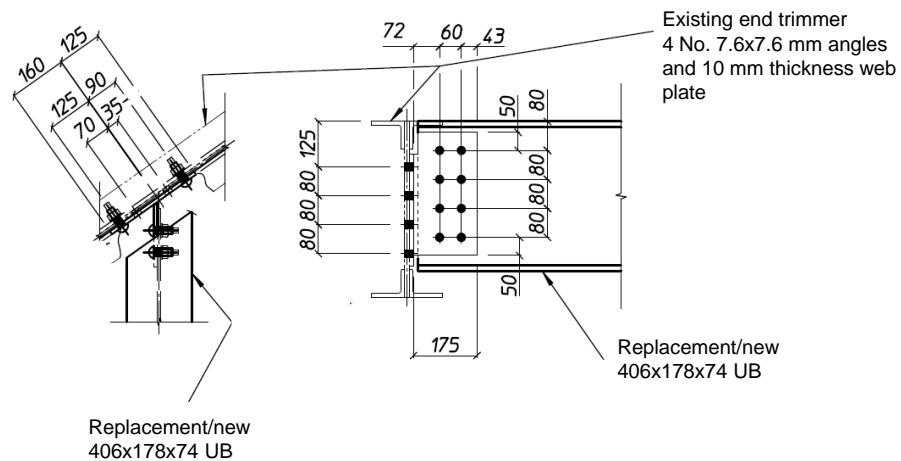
Cross beam to End trimmer connection details (units in millimetres) (WSR).
